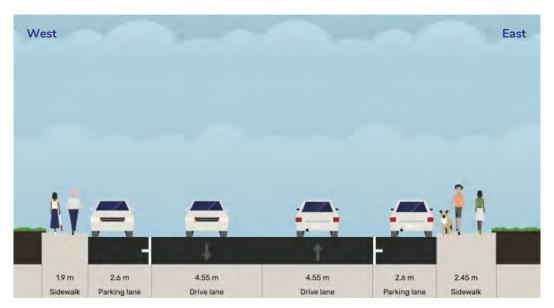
Existing Southern 4th Street Cross-Section Between B Avenue and A Avenue
